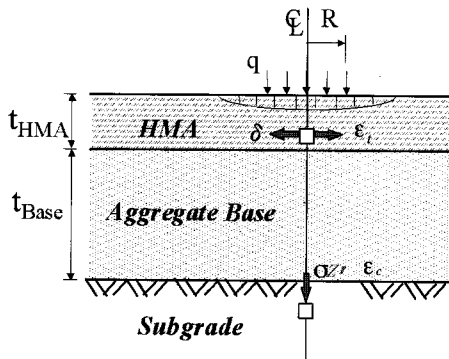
Critical Pavement Responses of Conventional Flexible Pavement
